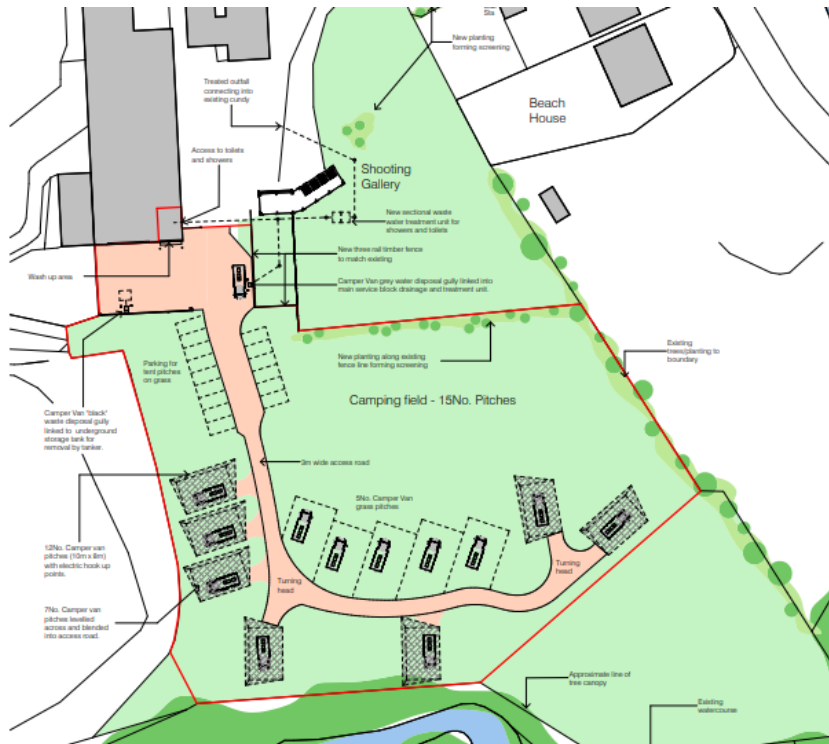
Proposed site layout plan extract (plan ref. 491(CA) - P05 Rev 03)
